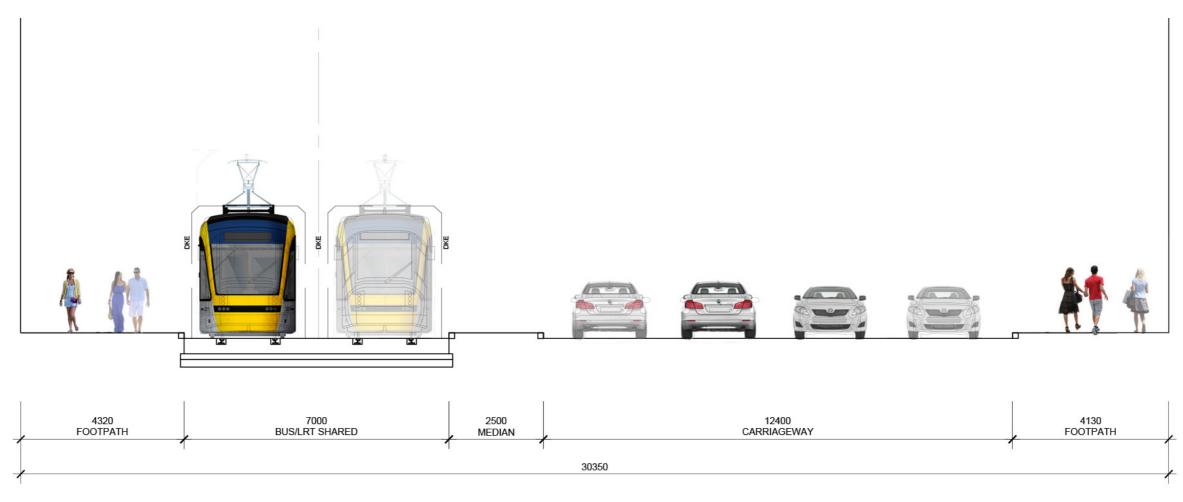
Partial plan and section of Customs Street West looking east towards Britomart
